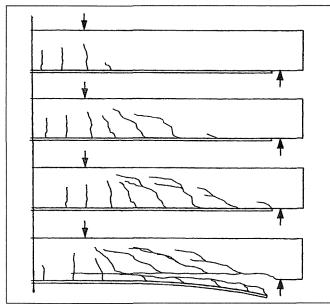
Anchorage failure (peeling off) (Hollaway and Leeming, 1999)
